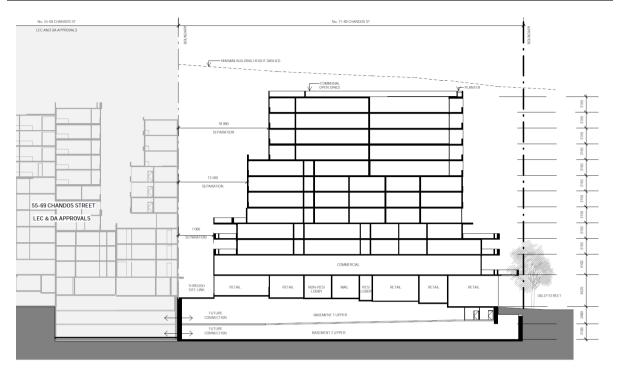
West elevation – separation distances (Applicant's Amended Architectural Drawings, p.23)
